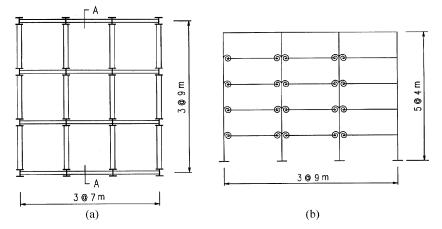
(a) Typical floor plan, (b) Side elevation of a semi-rigid composite frame (section A-A)
